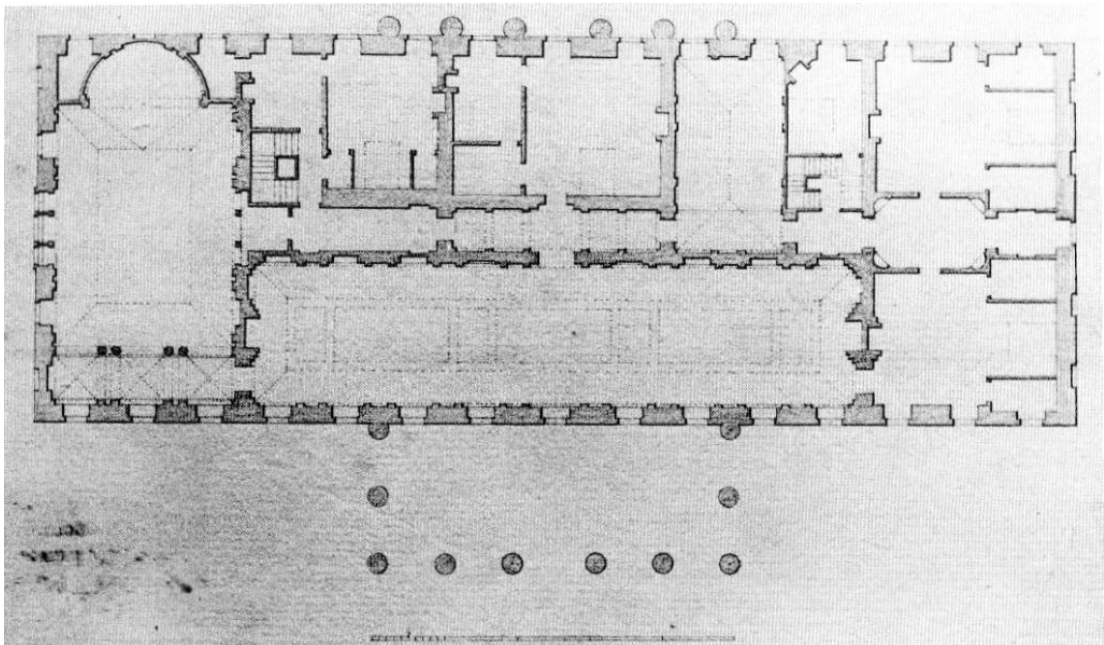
Plan drawing for Prior Park by John Wood the elder
